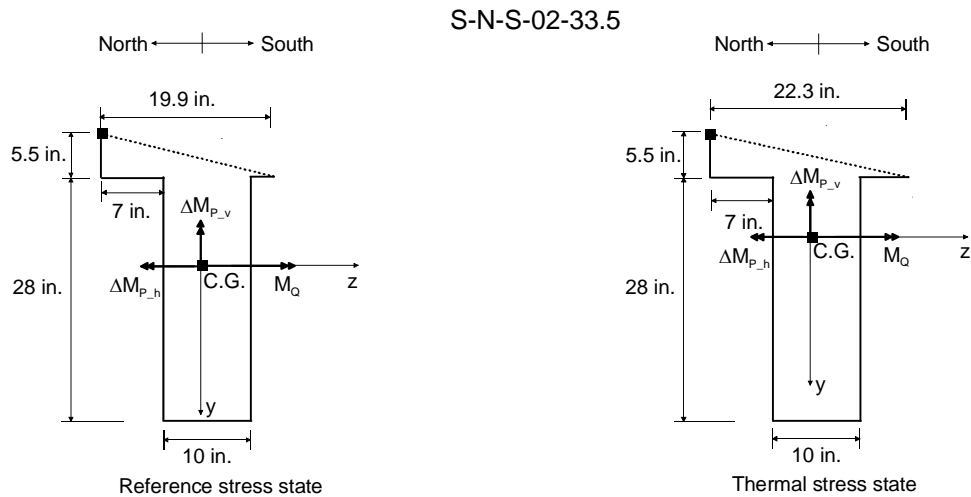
Contact areas at joint J2 at incipient joint opening on North side at elevation 33.5 in.
